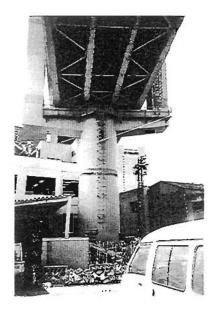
Hanshin Expressway Route 2 near the centre of Kobe- Damage to Circular Steel Pier Column viewed along the line of the structure shows a symmetric buckle at change in wall thickness
